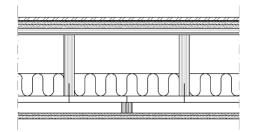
Floor structure. The layers of the floor from top to bottom were: a multilayer parquet (thickness h = 14 mm) on an underlayment (h = 3 mm), two 15.5 mm plasterboard layers, rib slab with a 27 mm LVL deck and 260 mm LVL beams (width 45 mm, c/c = 490 mm), a 95 mm glass wool layer between the ribs, overhead boards from LVL deck (h = 27 mm, b = 100 mm, c/c = 550 mm) screwed below the ribs, LVL battens from LVL beams (h = 45 mm, b = 45 mm, c/c = 490 mm) screwed to the overhead boards between the ribs, and two 12.5 mm plasterboard layers.
